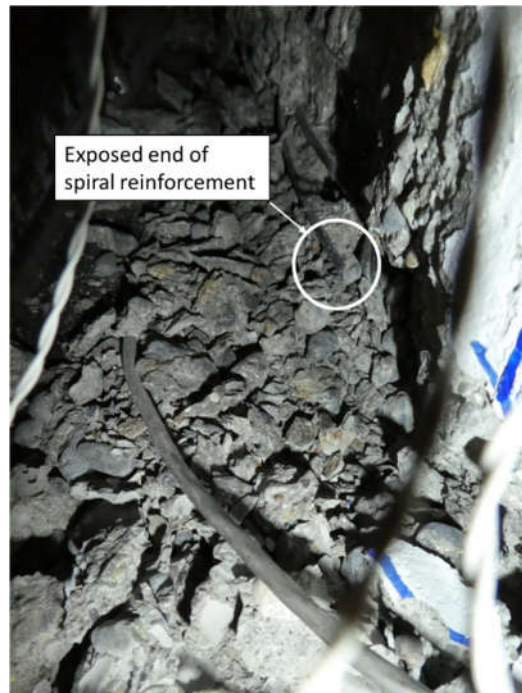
Substantial spalling at base of column, Series 7
